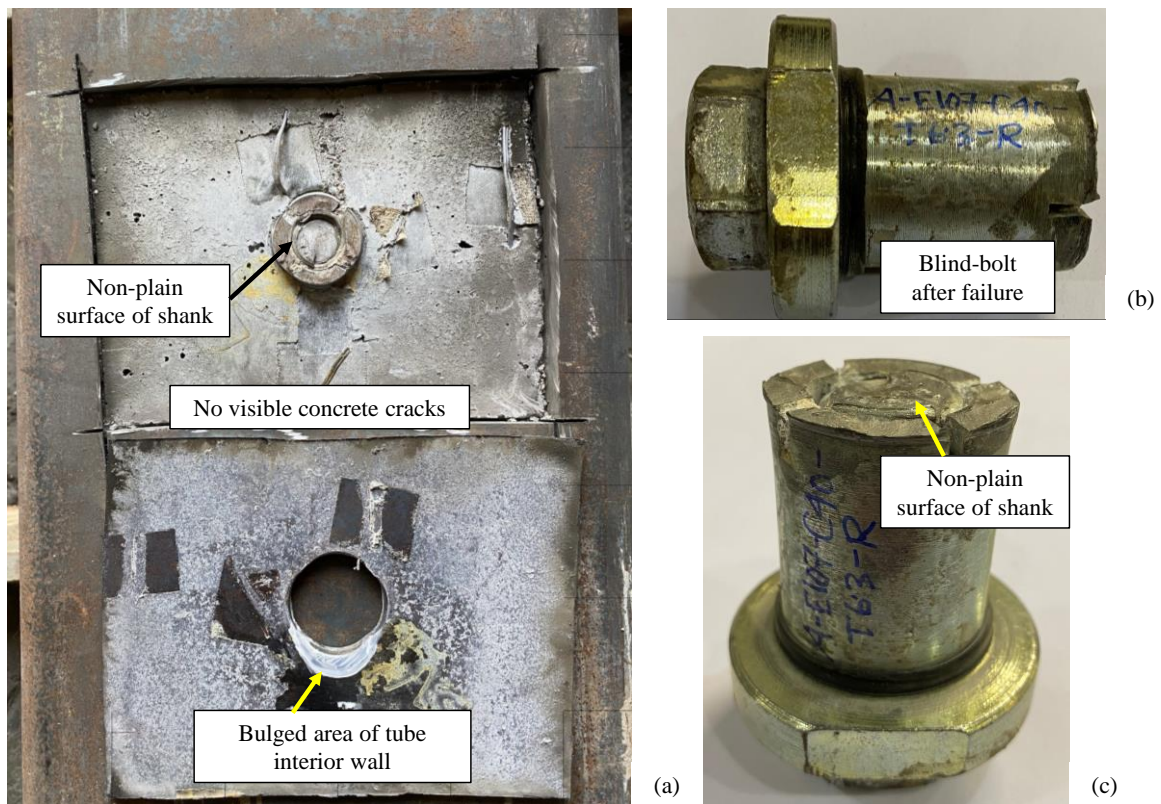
Specimen A-E107-C40-T6.3 (a) Concrete and tube wall surface after test; (b) Bolt after shear failure; (c) shank surface after failure.
